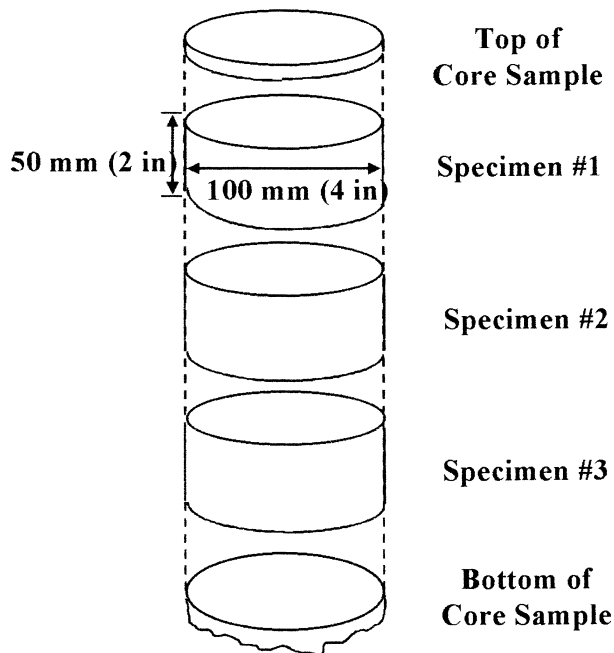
RCPT specimen configuration for specimens cut from a concrete pavement core sample.
